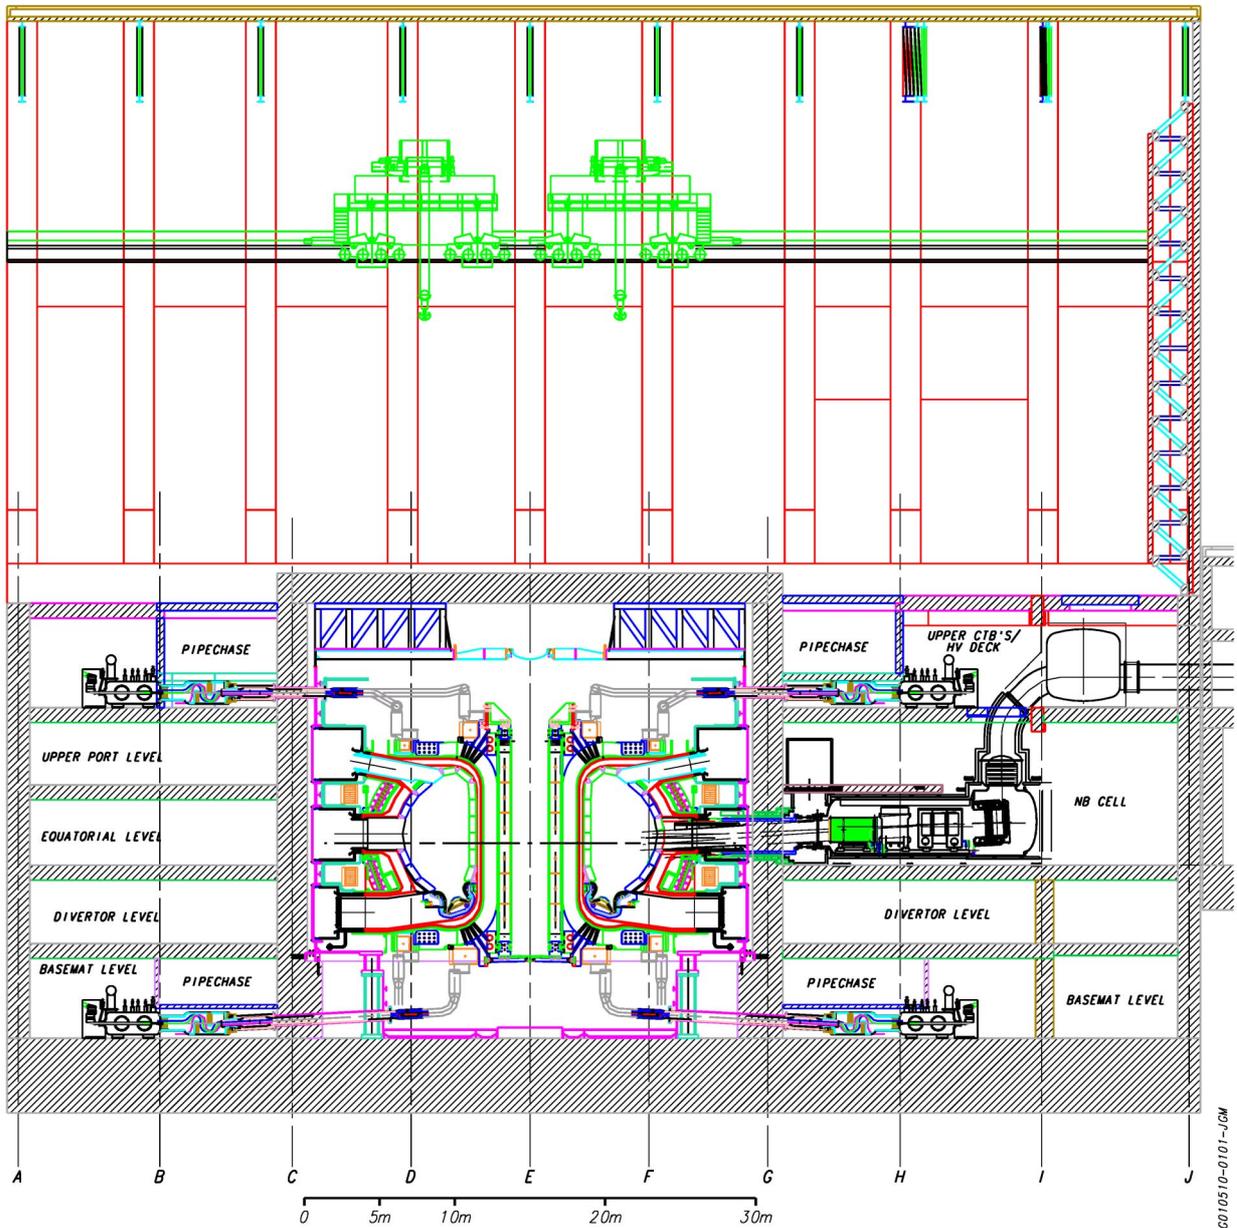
Cross-section NS Through the Tokamak Building
